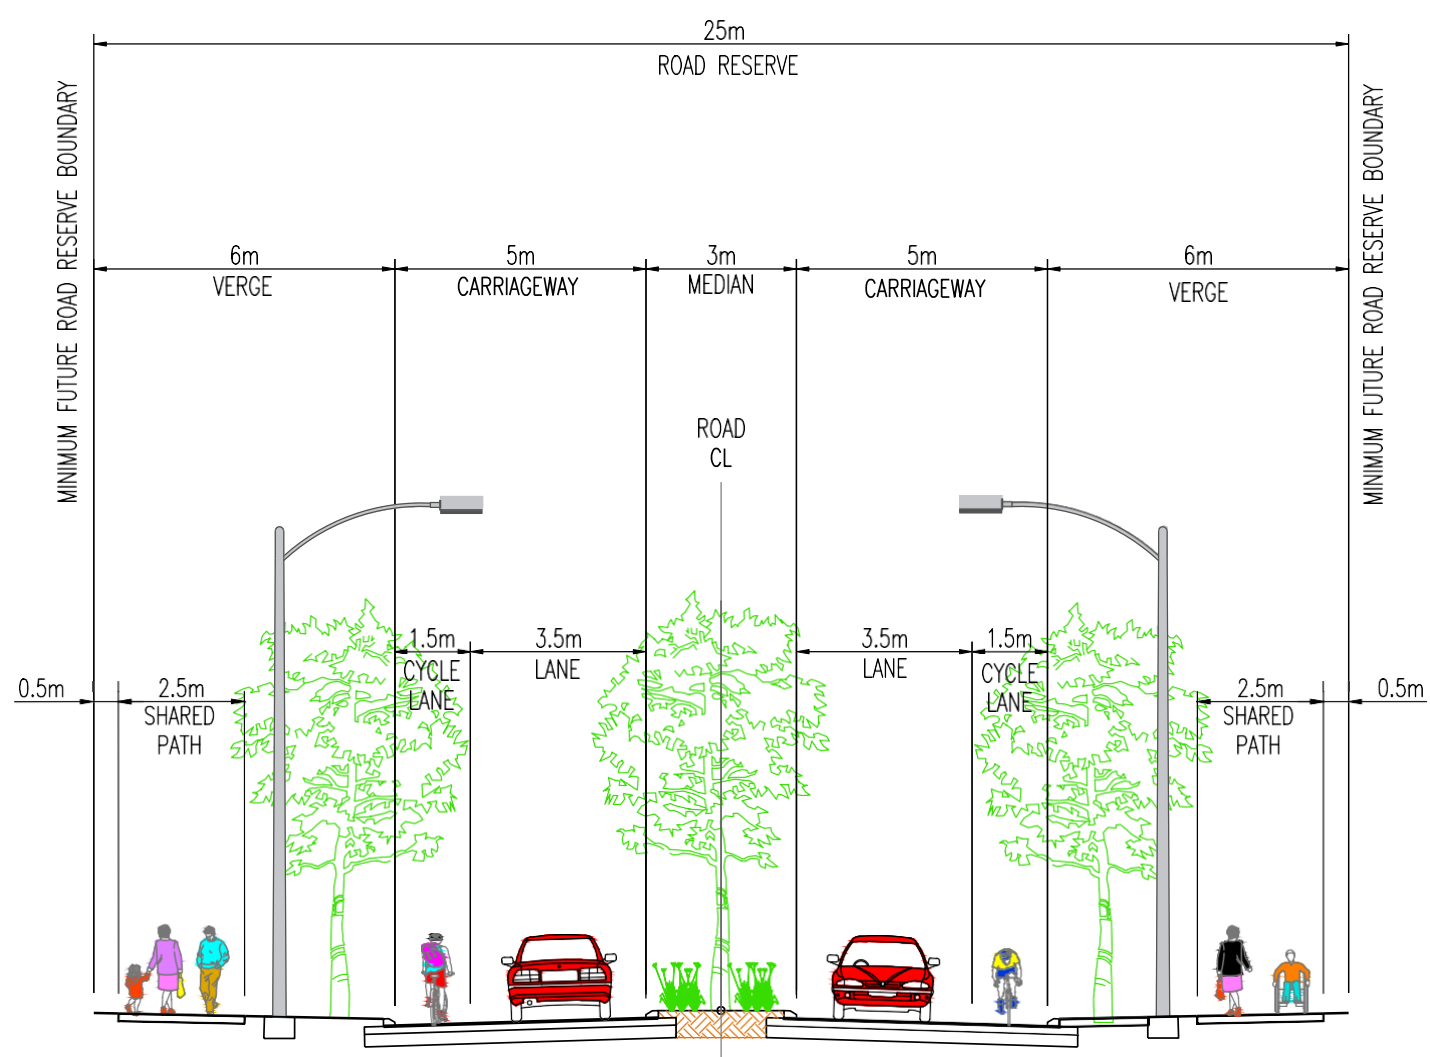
CROSS SECTION OF NEIGHBOURHOOD CONNECTOR A
